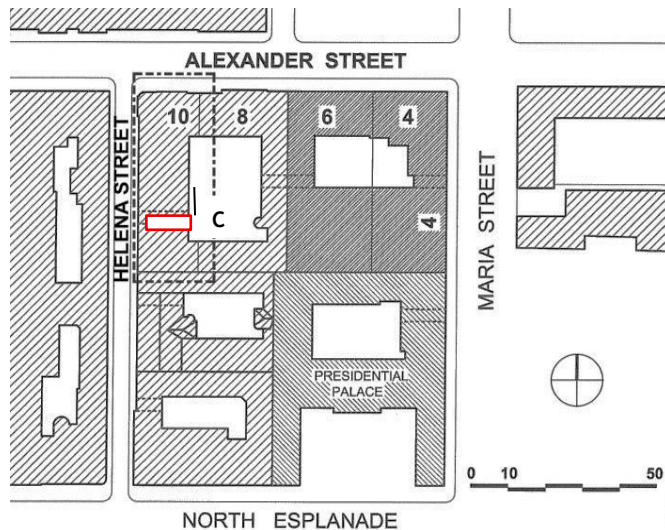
A. The buildings at Alexander Street and the corridor (C) to Helen Street 5.
